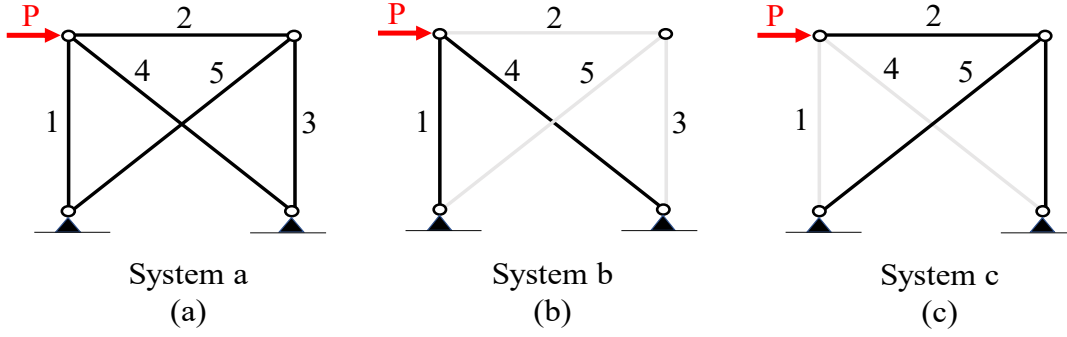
Truss structure; from (a) to (c): fully intact, 1<sup>st</sup> failure mode, 2<sup>nd</sup> failure mode.
